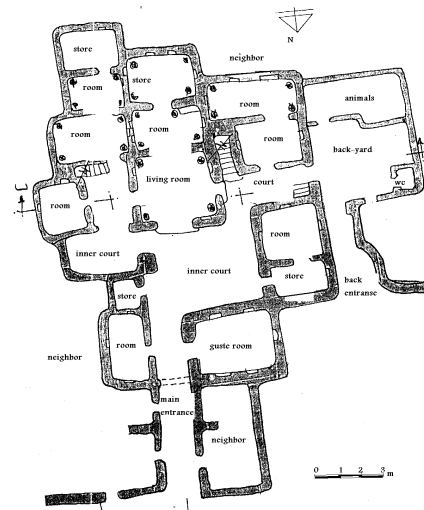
Abdel-jawad Khalaf- Allah"- house in Al-Qasr 'ground floor' plan. (Hamad 1996, and update by the author 2007)
